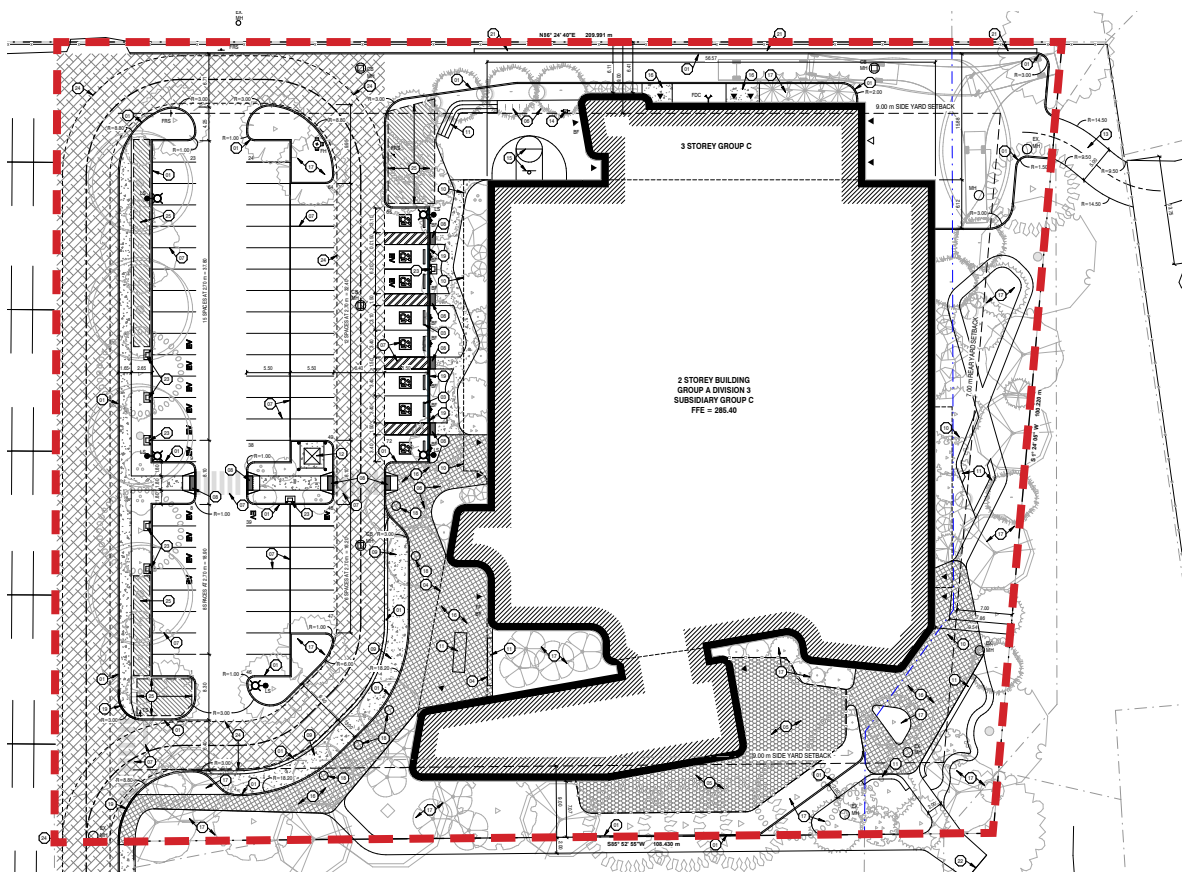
Proposed Site Plan by Martin Simmons Sweers Architects
